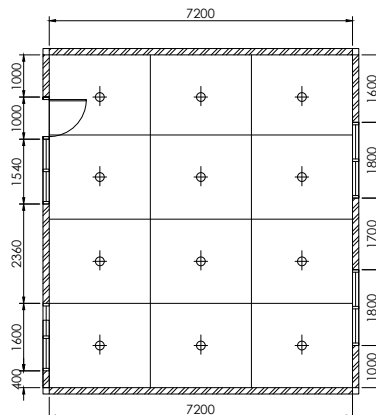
Proposed Ceiling Lighting Plan for Classroom X-7 Santa Maria
